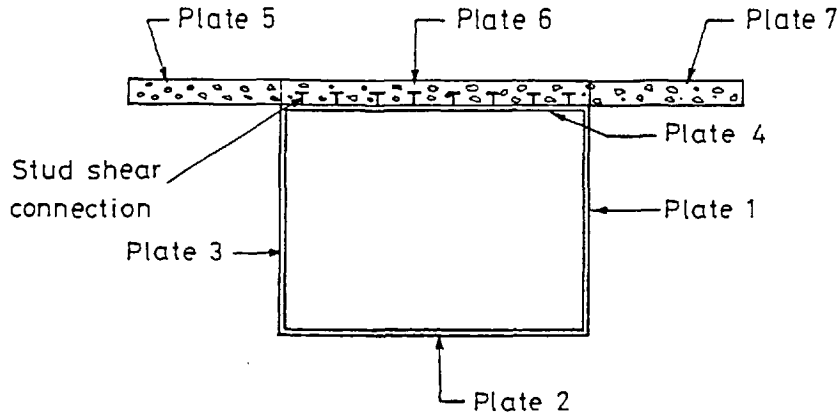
Simplified cross-section of a typical closed composite box girder
